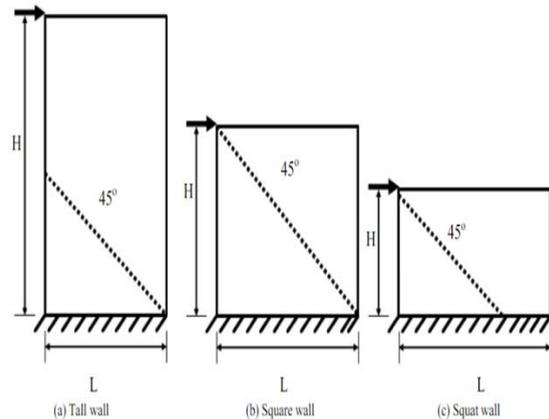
Direction of diagonal cracks in masonry shear walls [38].
